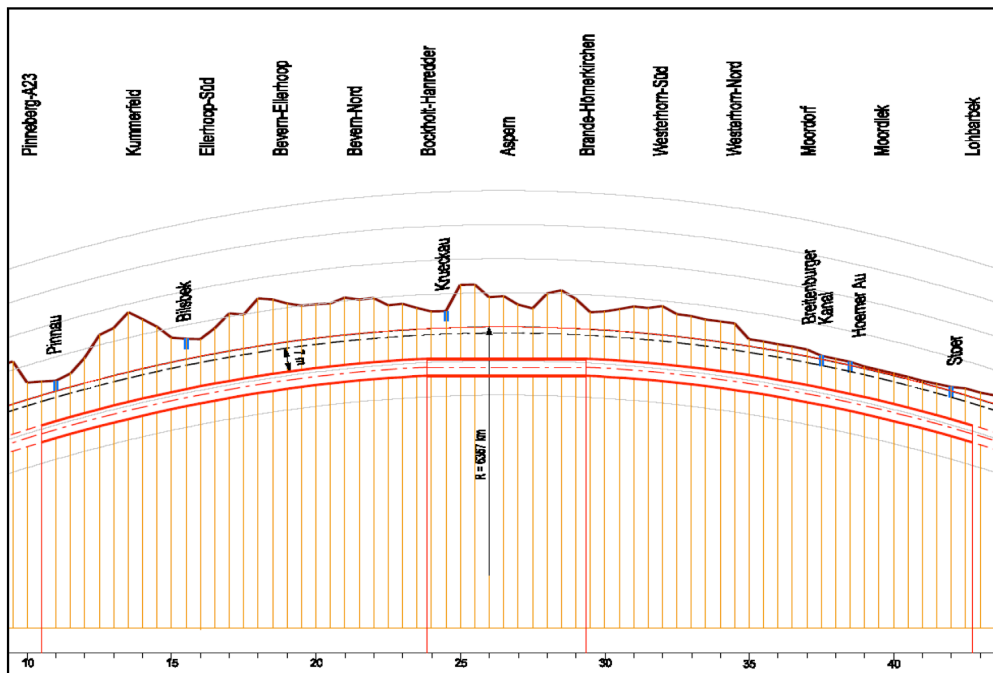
Elevation of the main tunnel at the potential ILC site at DESY in Hamburg.
